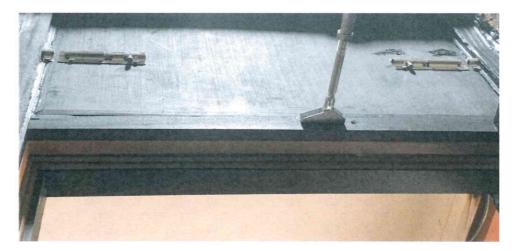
Fire seal & smoke seal arrangements at the head of door frame
